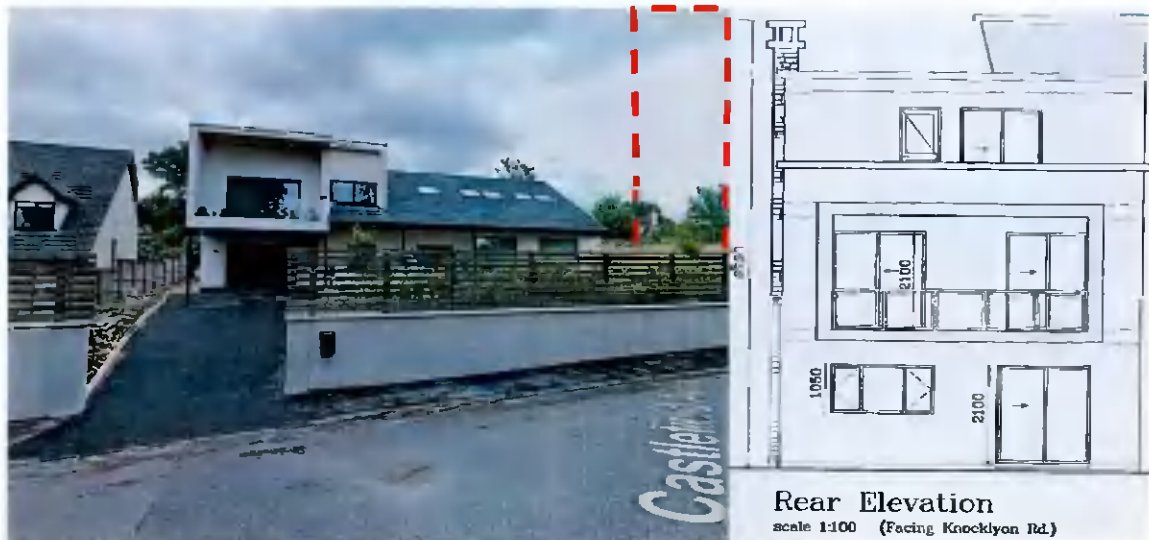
Client's adjoining dwelling is mostly single storey with a 2 storey element adjoining the site
